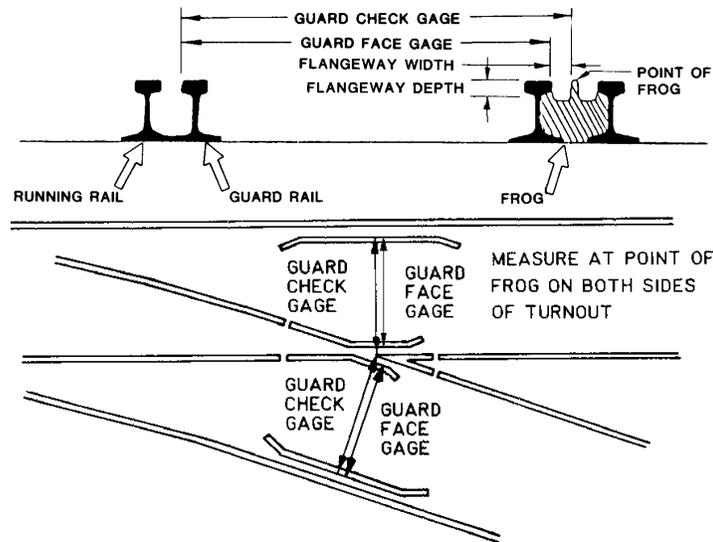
Measurement of Flangeway Width, Flangeway Depth, Guard Check Gage, and Guard Face Gage
